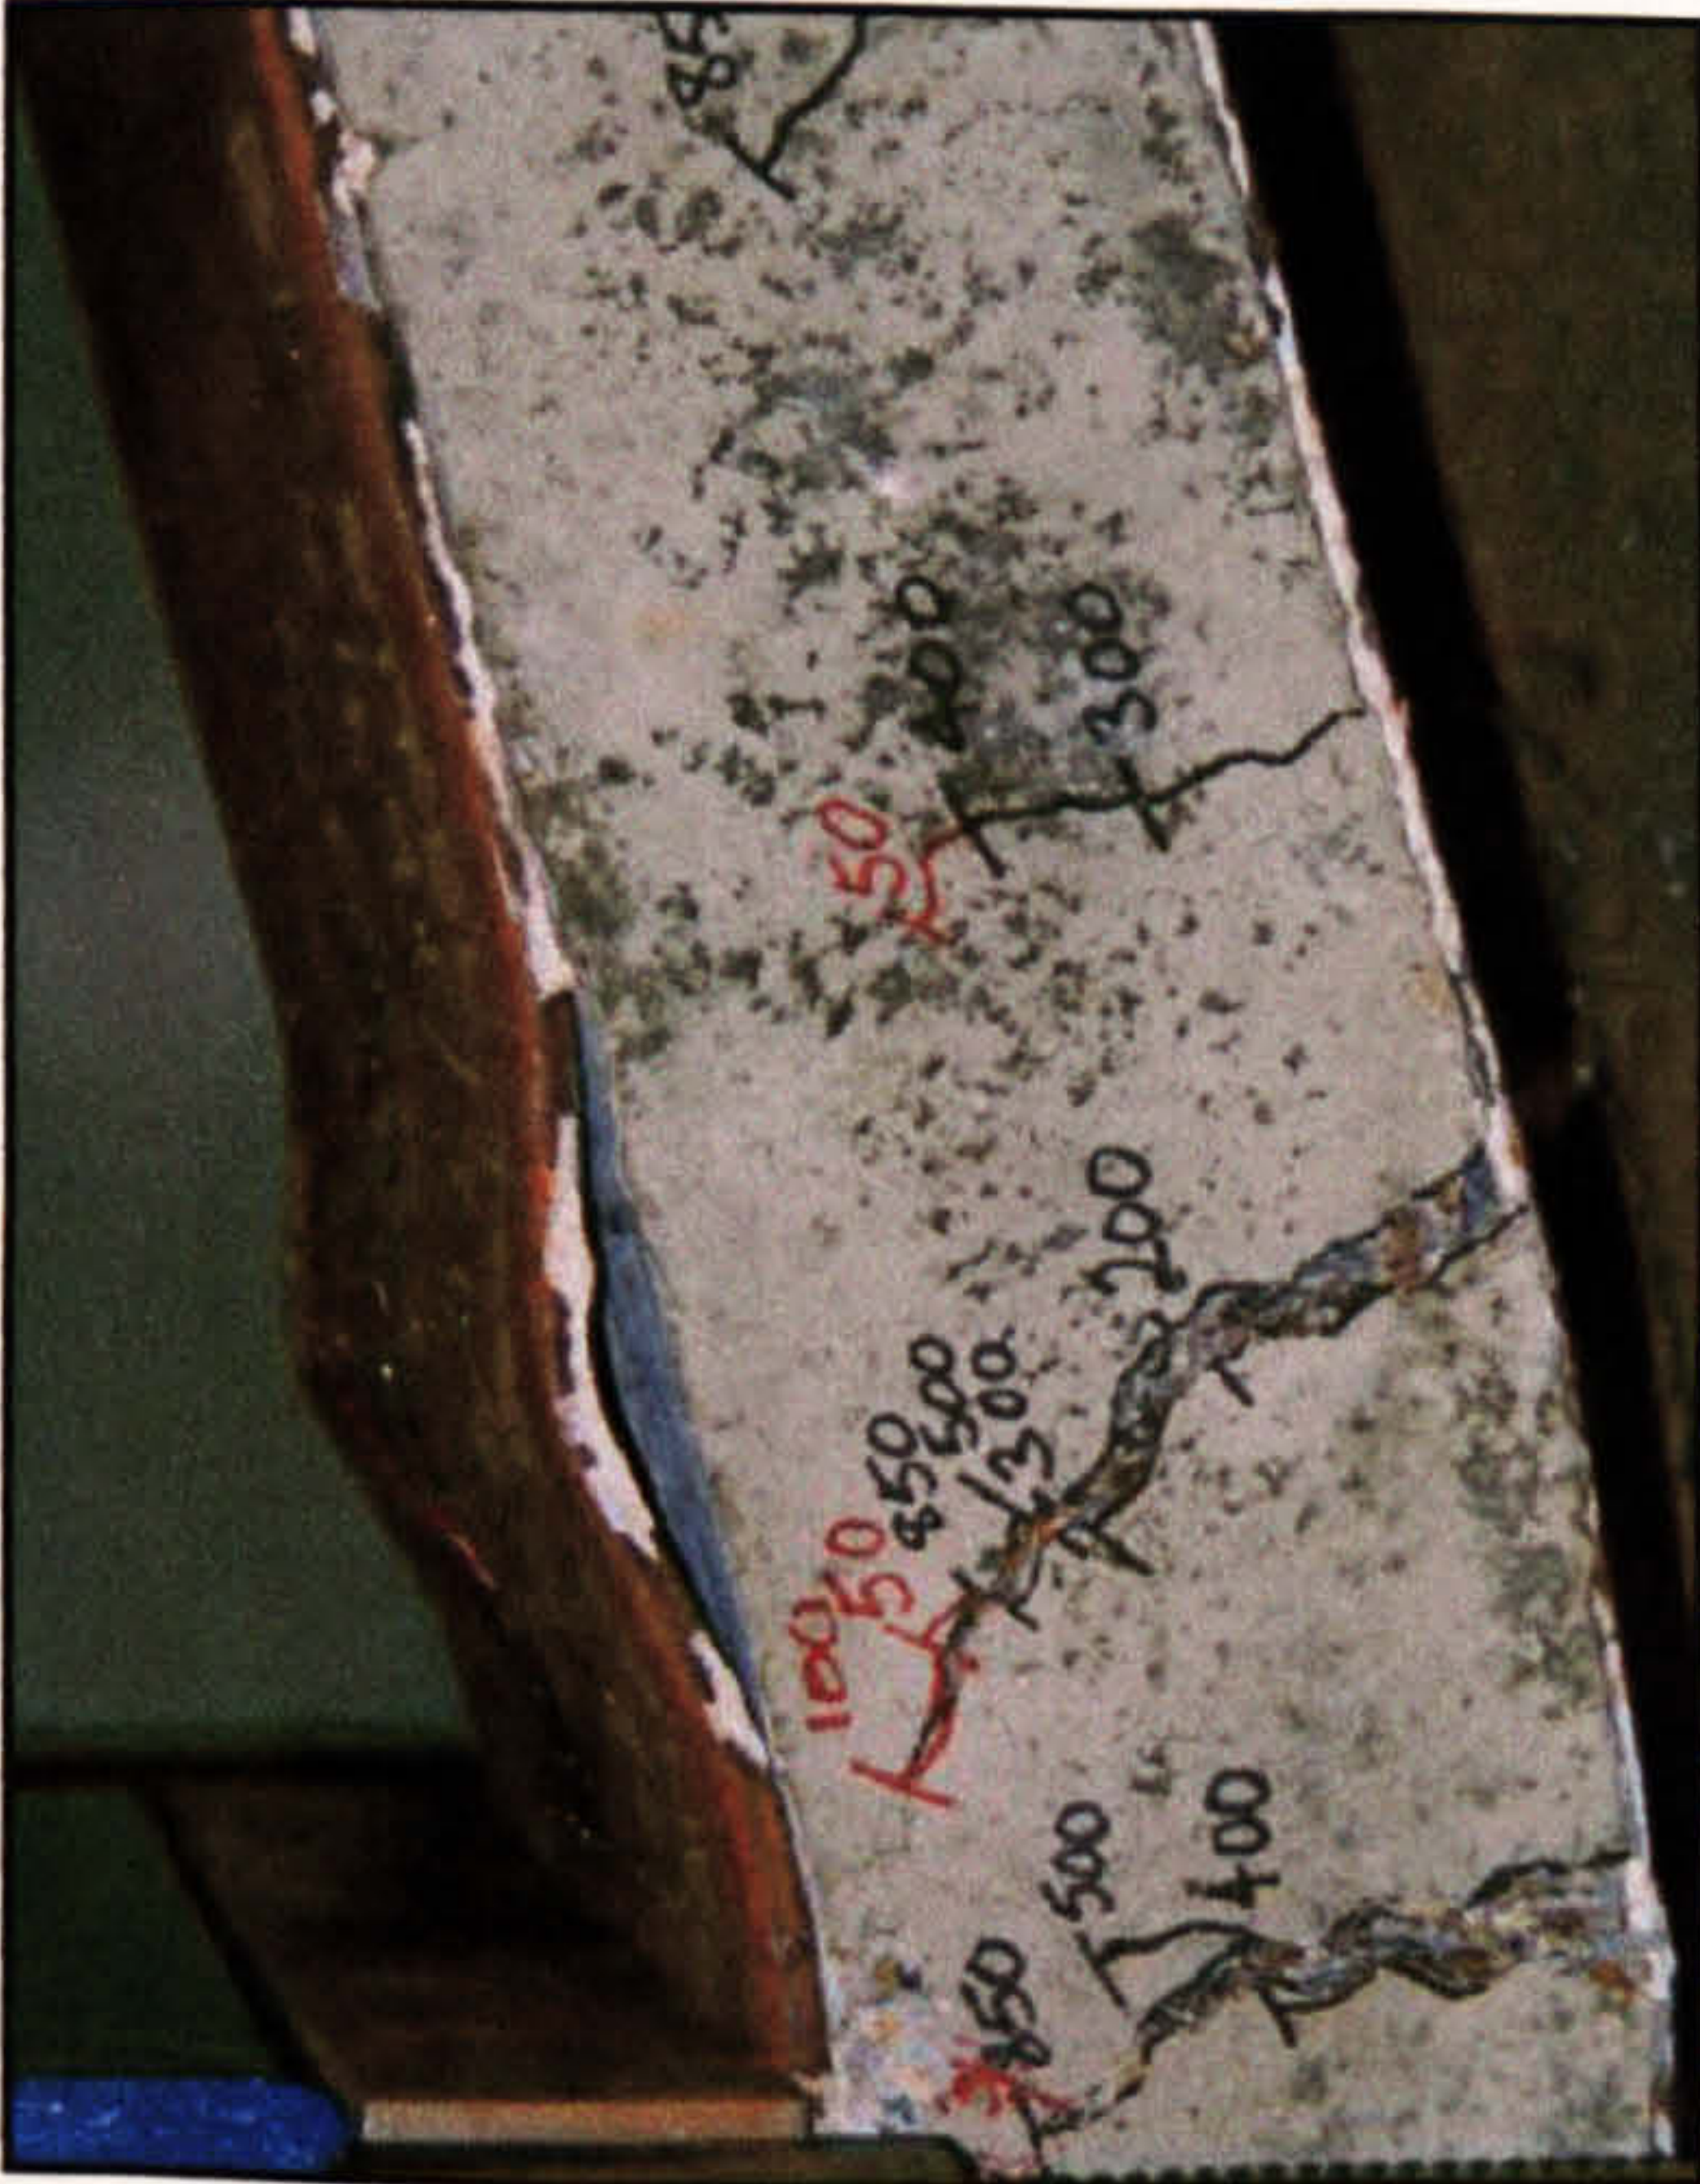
Close-up of failed area showing concrete cracks originating from connector locations. Crack progression is marked in black for load (kN).
